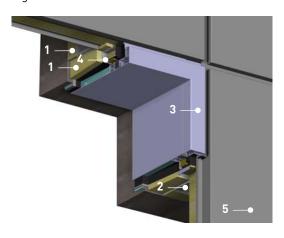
Window frame on the joints, level with the surface of Qbiss One B façade elements - DEEP VERSION
